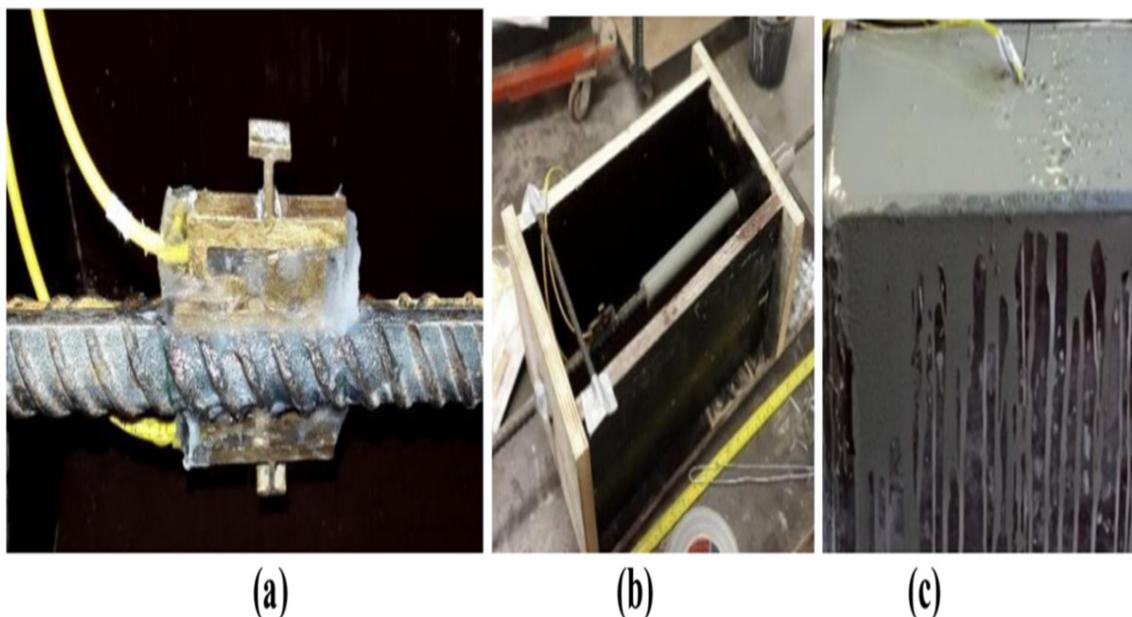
(a) Final aspect of the sensors fixed to the rebar; (b) formwork structure with the rebar and (c) formwork filled with concrete.
